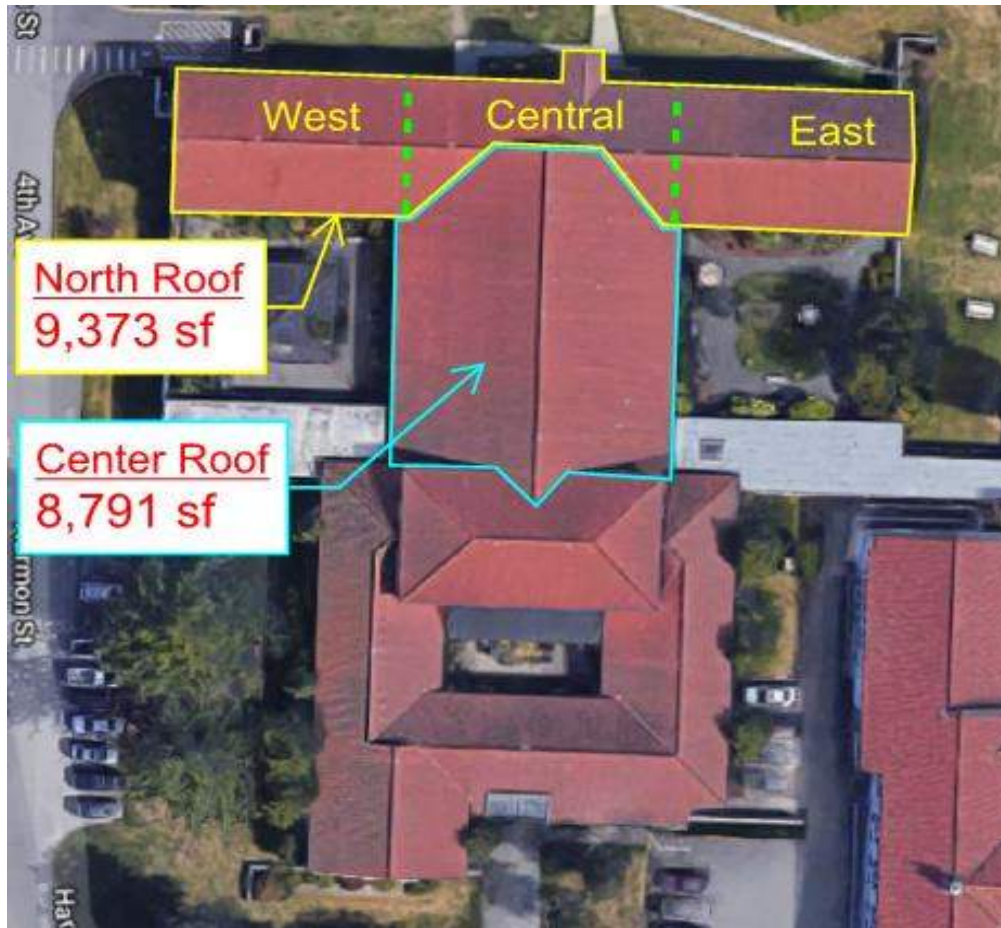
Depicts an overview of the roof areas at the 2010 Building. The yellow outlined roof area at the north end of the building represents the requested area of roof to be included in the roof survey. The north end (yellow) roof area, as the focus of our survey, measures approximately 9,373 square feet. The roof area outlined in blue represents the additional roof area recommended to be included into a reroofing project as a result of visual deficiencies observed as part of our preliminary roof survey. The additional roof area, outlined in blue, measures approx. 8,791 square feet.
